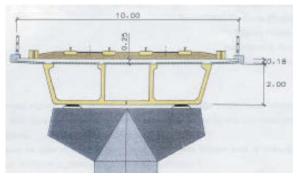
& 29: U-beam for railway bridge with longitudinal joint to form a tricelular box
